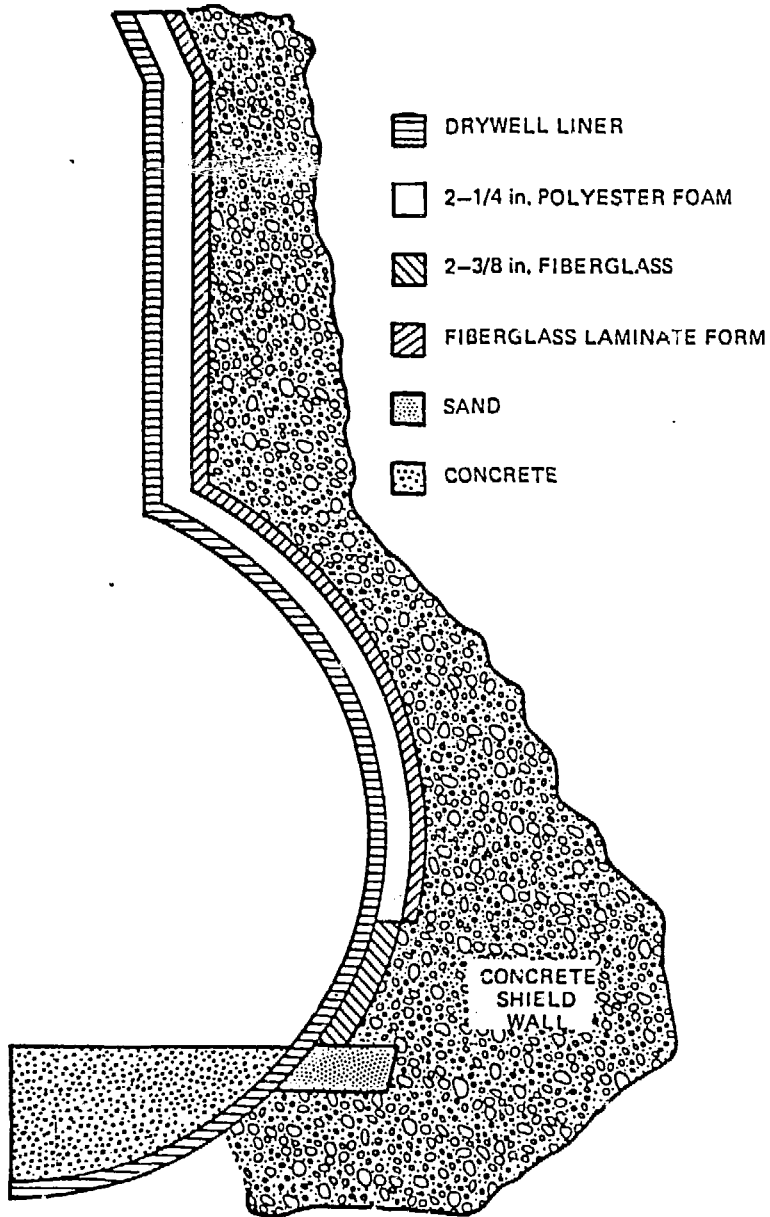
Drywell Liner - Concrete Shield Wall Gap Geometry (ORNL-DWG 83-4244 ETD)
